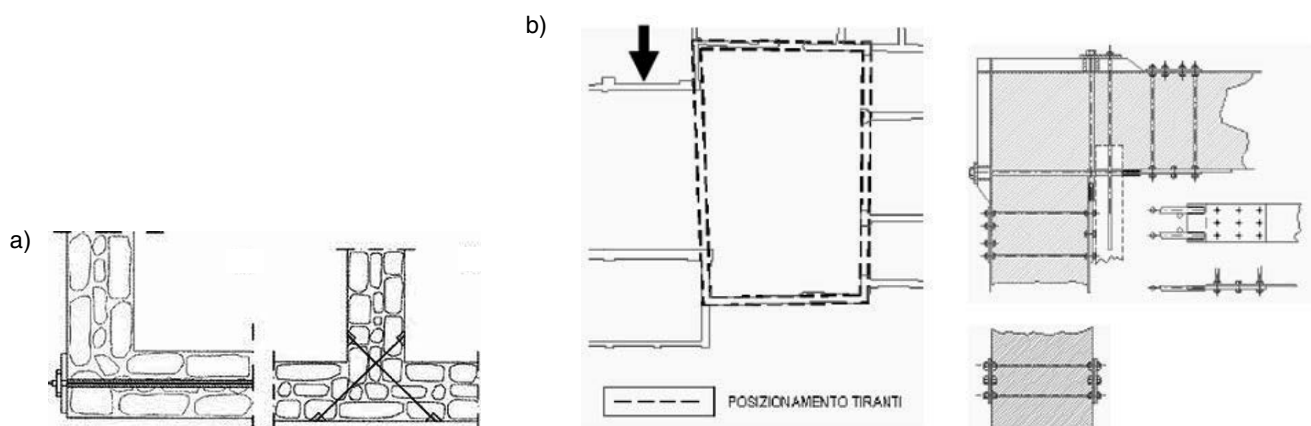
Steel tie-beams for wall-to-wall (a) and wall-to-floor (b) (Modena, 2007).
